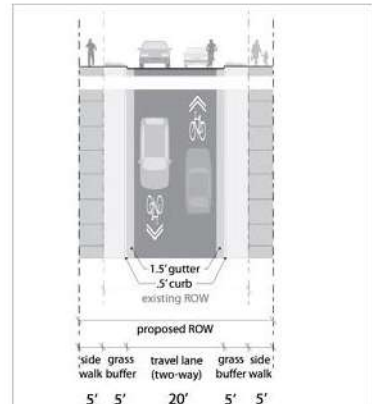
Neighborhood Street Expanded ROW - 30' ROW + 10'
